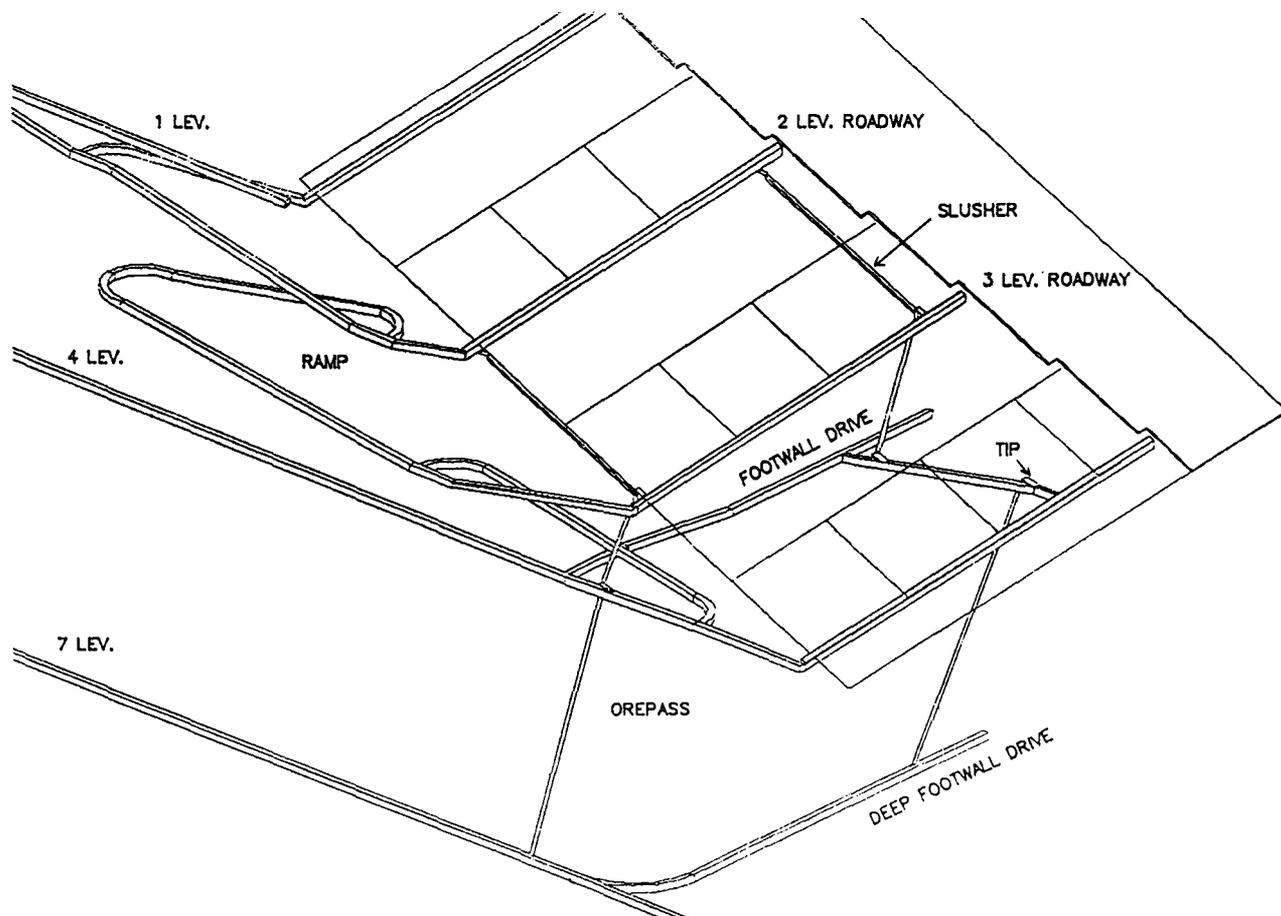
Layout of the first backlength in a semi-trackless stope (not to scale)
